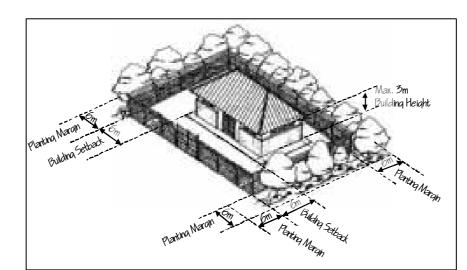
Typical Substation Building with Landscaping As Buffer
